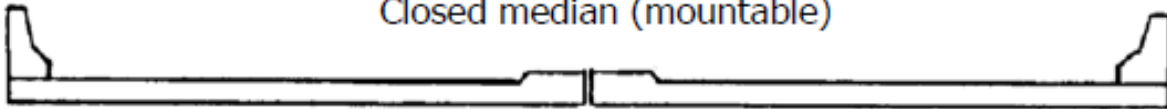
Cross-section view of a bridge deck with closed median (mountable)
